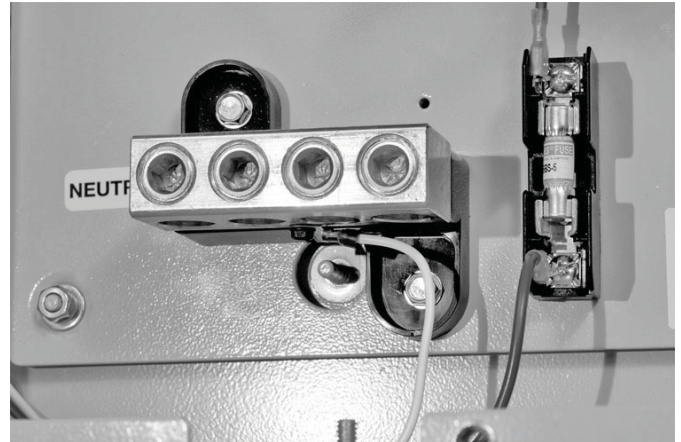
RTSN Fuse Block Installation T1 Connection
